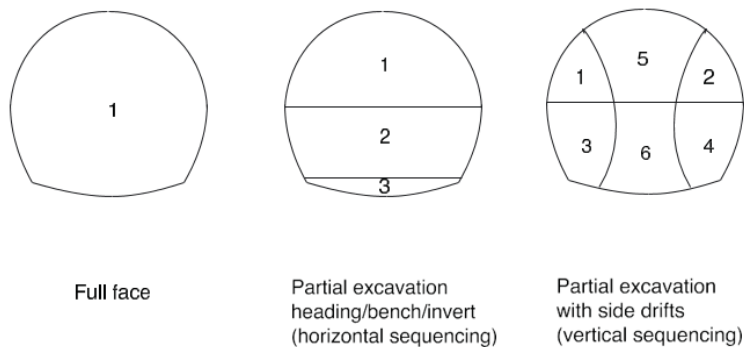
Typical Excavation Sequencing Types in Conventional Tunneling
